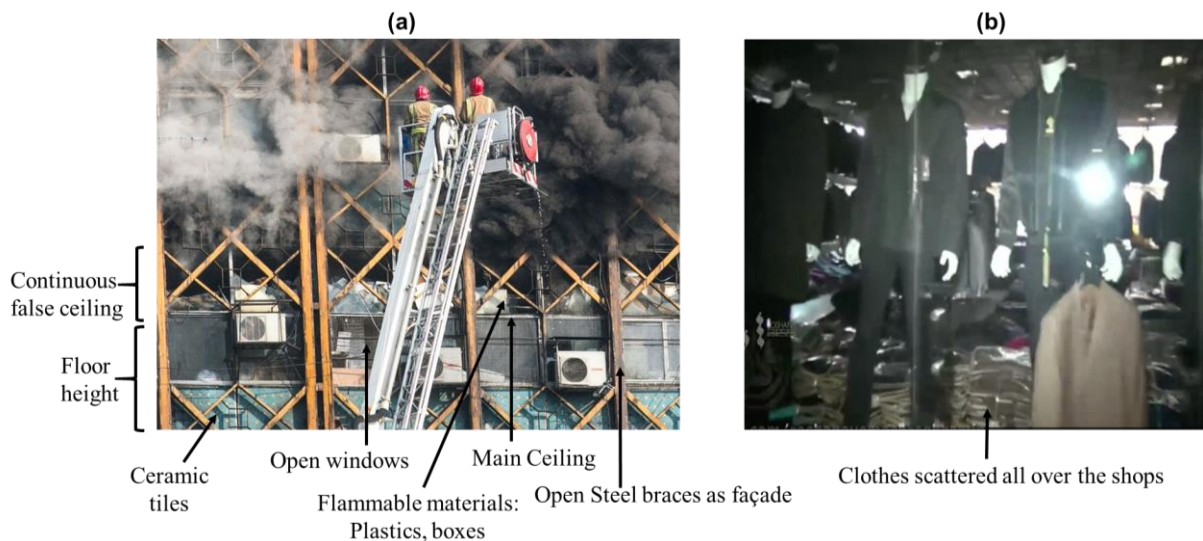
(a) Detail of the front view of a floor and false ceiling, (b) typical shop in the Plasco Building.
